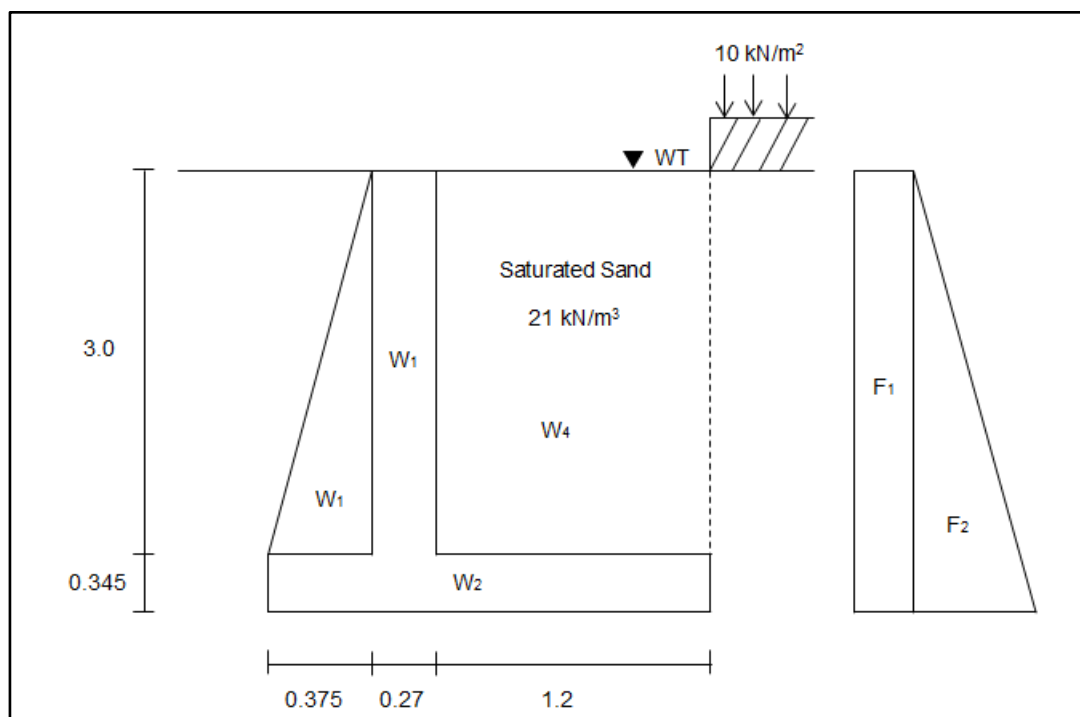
A cross sectional side view of the subsurface dam wall. All measurements are in meters (m) with a surcharge pressure of 10 kN/m<sup>2</sup> acting on the backfill behind the wall. F1-2 represents the horizontal overturning force and W1-4 are the vertical resisting force acting on the base. The saturated sand has a saturated unit weight of 21 kN/m<sup>3</sup> which was estimated in the Soil Parameters section above.
